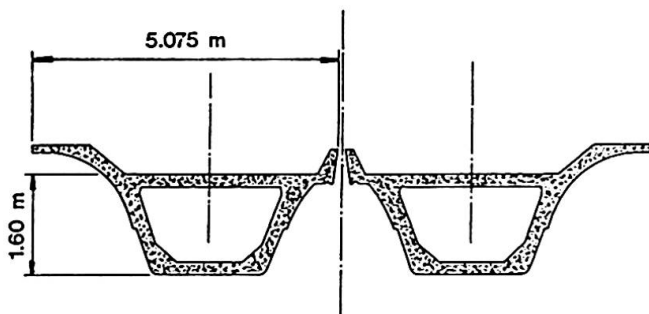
TYPICAL VIADUCT CROSS-SECTION FOR SINGAPORE MRT SYSTEM
